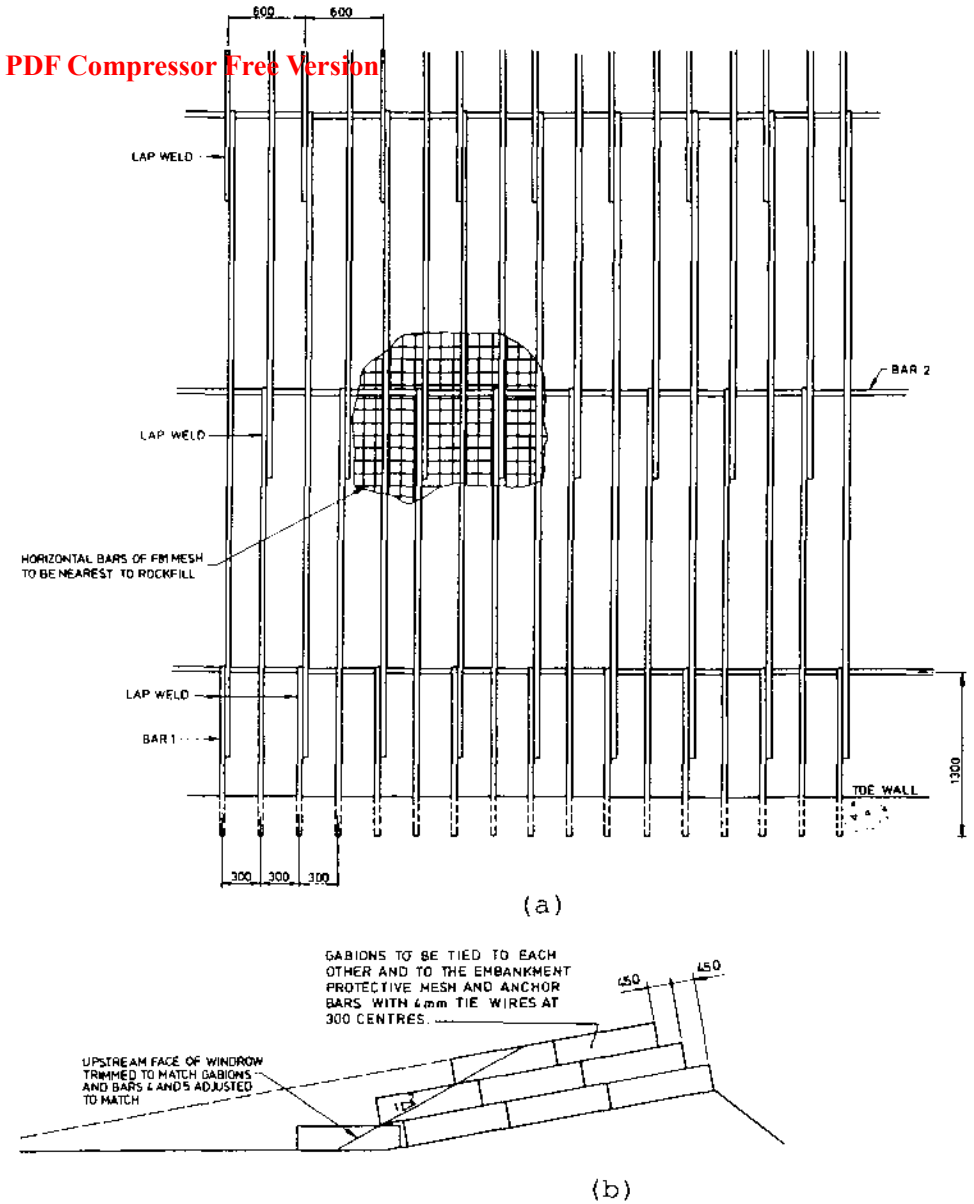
Steel mesh reinforcement for Clarrie Hall Dam, a) dam detail; b) crest gabions.
